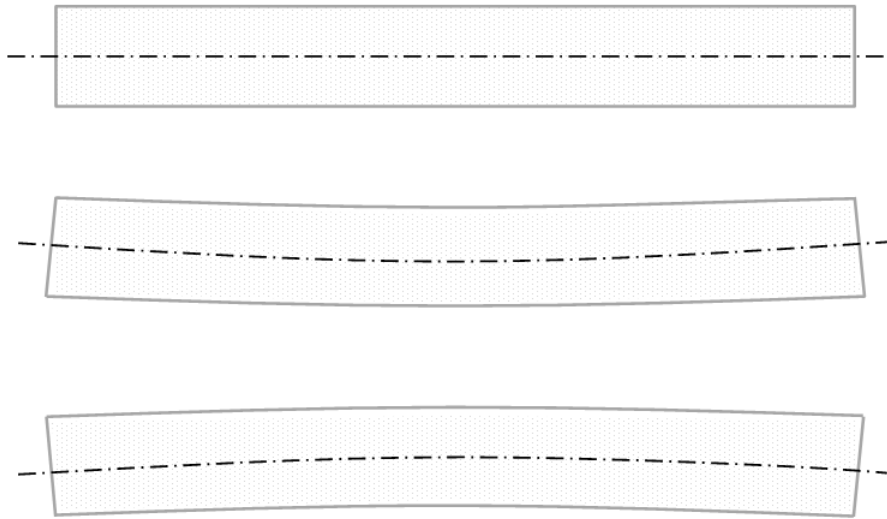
Concept drawings of prestressed concrete sleeper curling geometry
